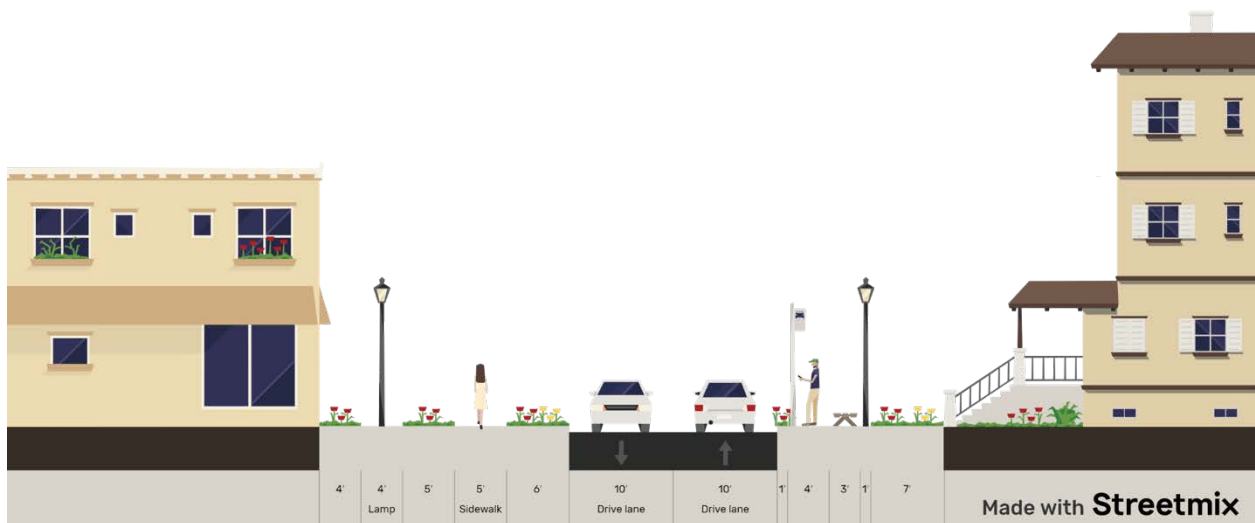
The proposed cross-section of Hopkins Street, facing north; the main roadway leading to the Tide to Town Trail on 48th Street. The new design includes a furniture zone, streetlights along the housing units (to the right), and a shared bike lane next to the driveway. Diagram created in Streetmix by EC, 2022.
